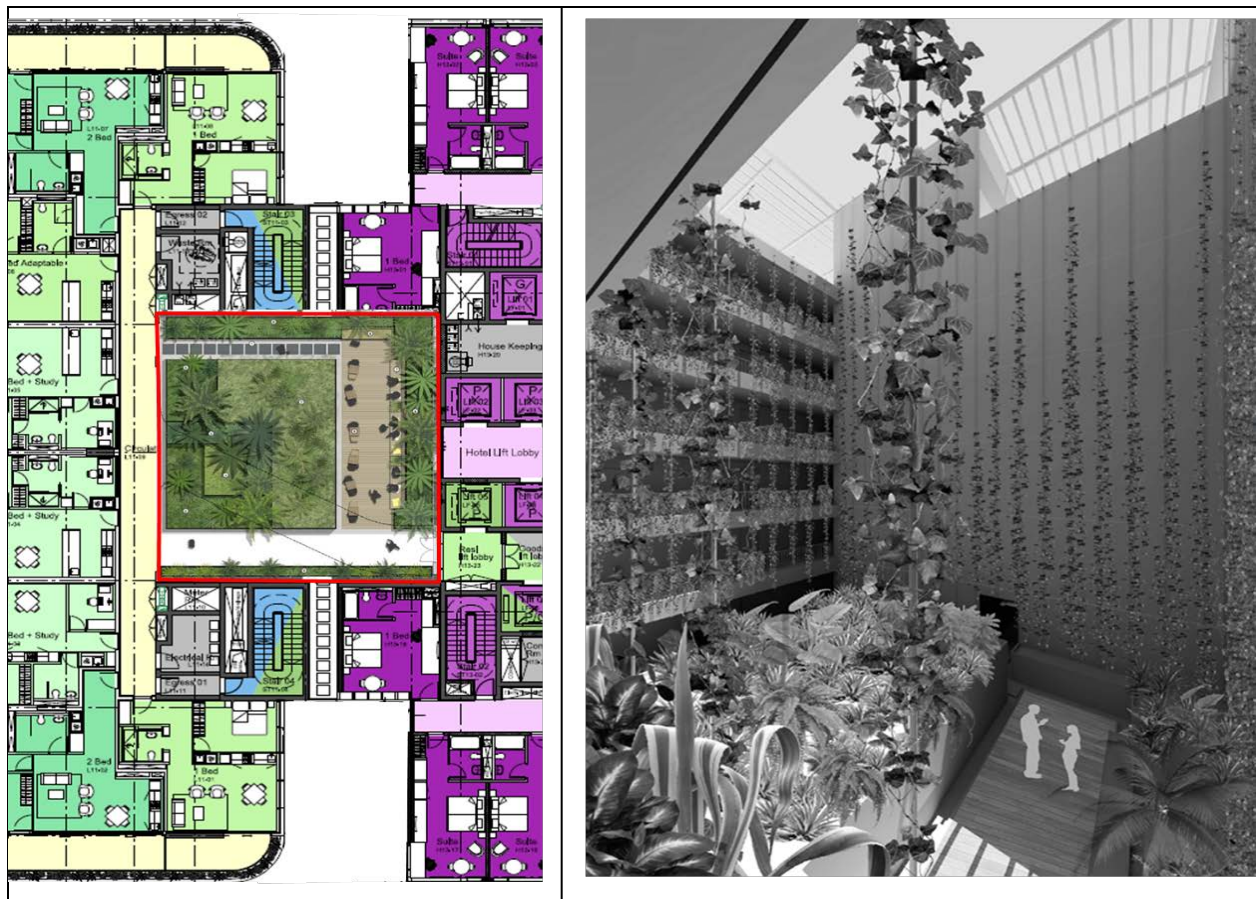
Internal residential courtyard layout (left) and solar access (right) (Base source: Applicant's EIS and RtS)
